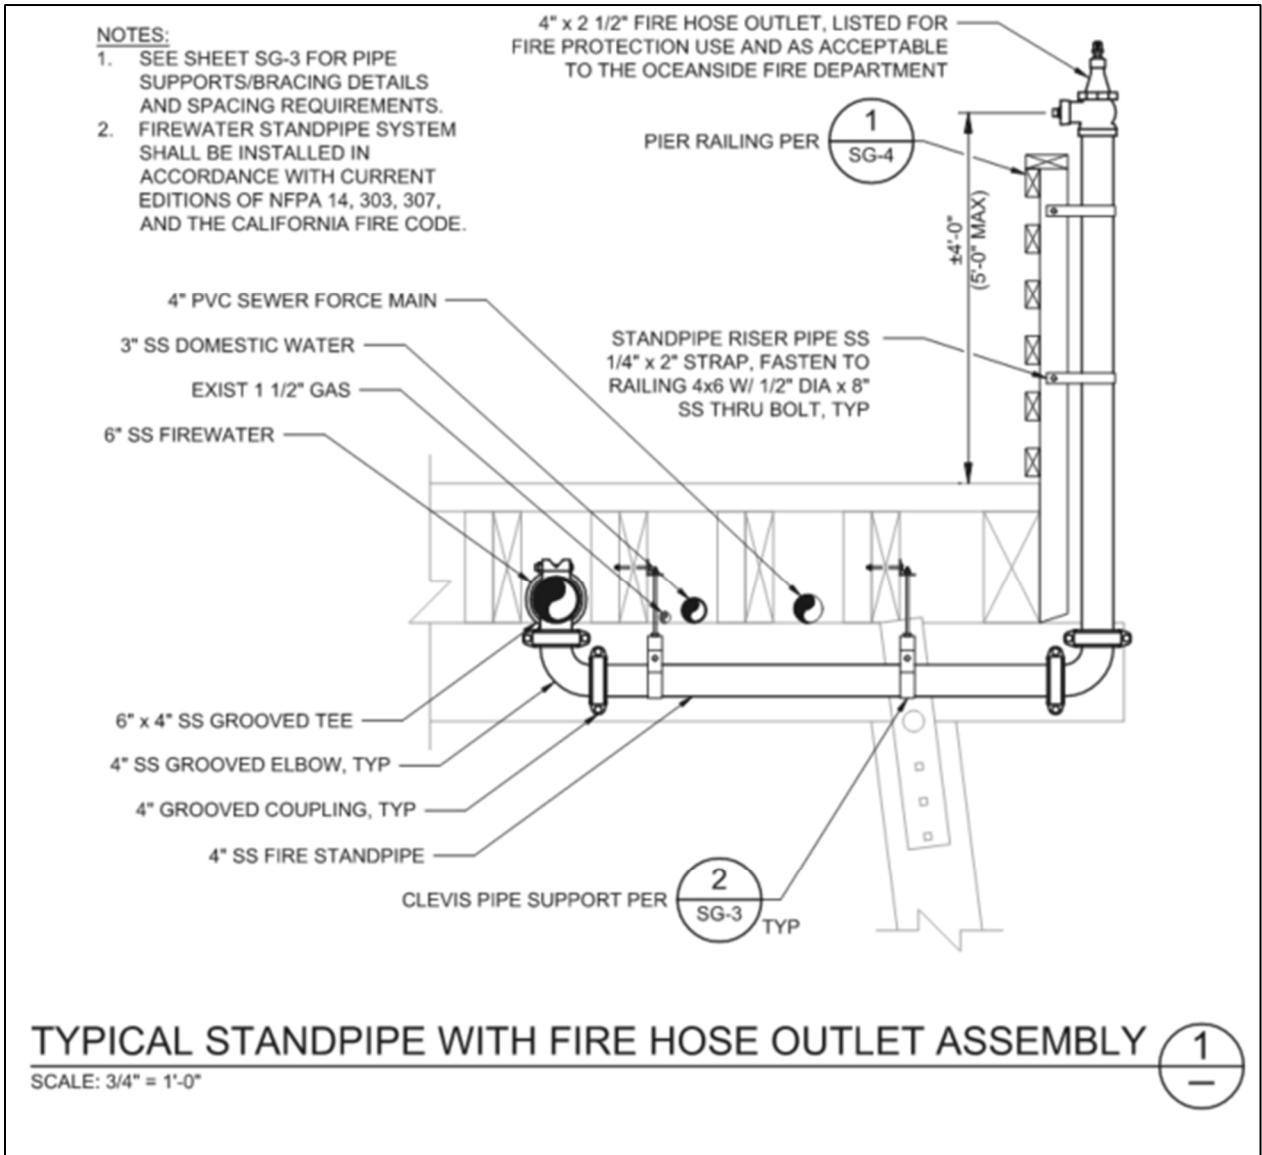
Reference detail, as-builts from 2024 utility replacement project. Fire water riser water located at Bent 24 is connected to replaced post. Protect utilities and post in place.
